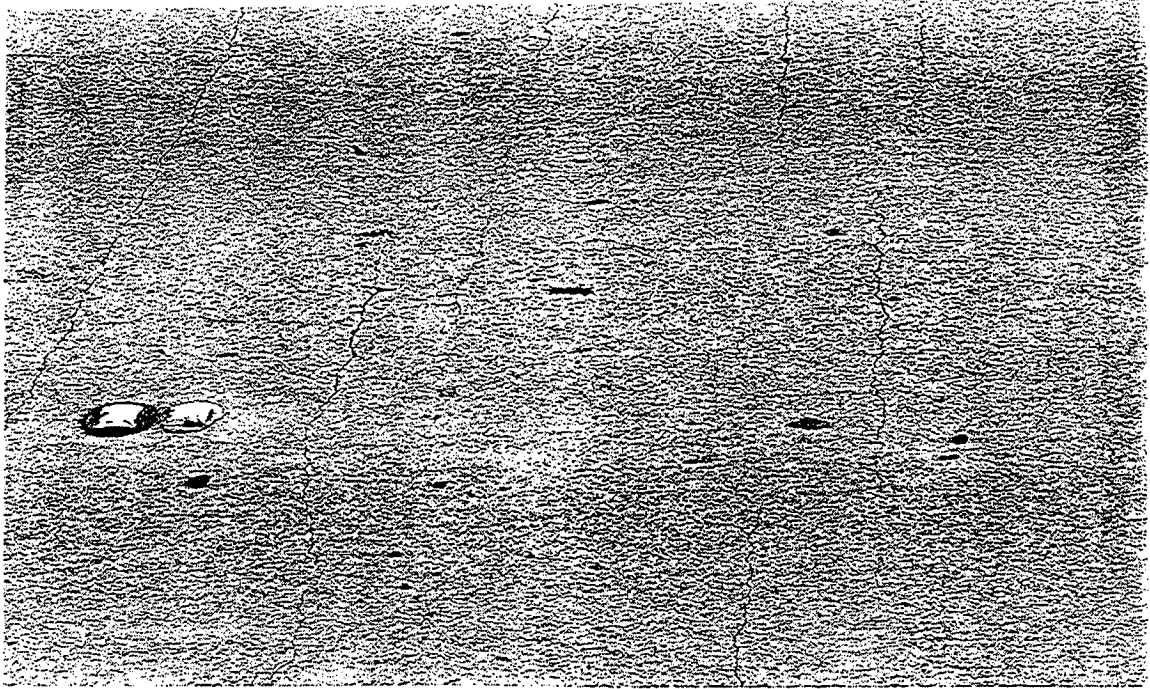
Close-up of Transverse Cracking on I-65 Bridge
